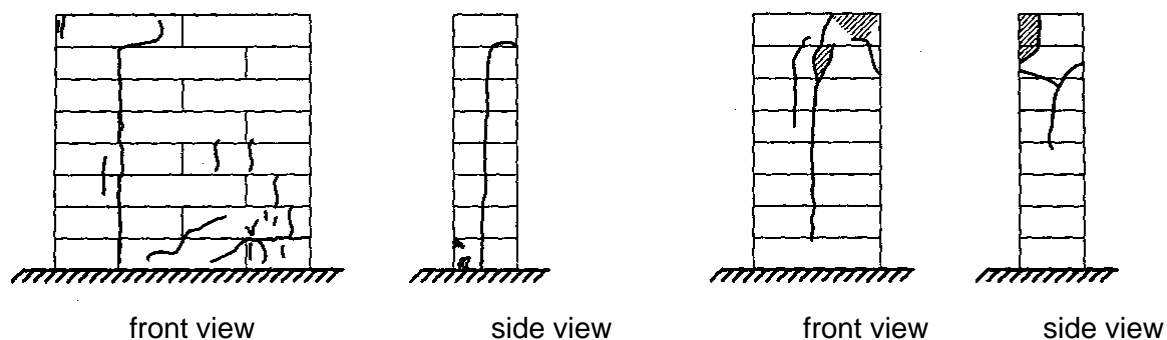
RW-specimens after testing. Left: front view and side view of a 430 mm long specimen. Right: front view and side view of a 210 mm long specimen
